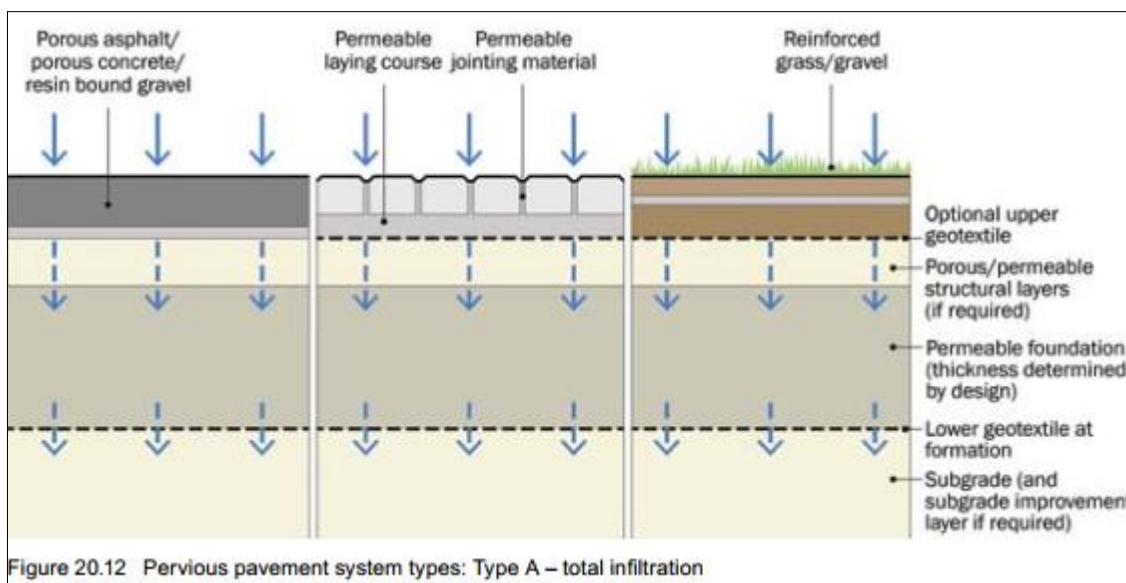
Typical Cross Section of infiltration permeable paving (Extract from CIRIA SuDs Manual)
